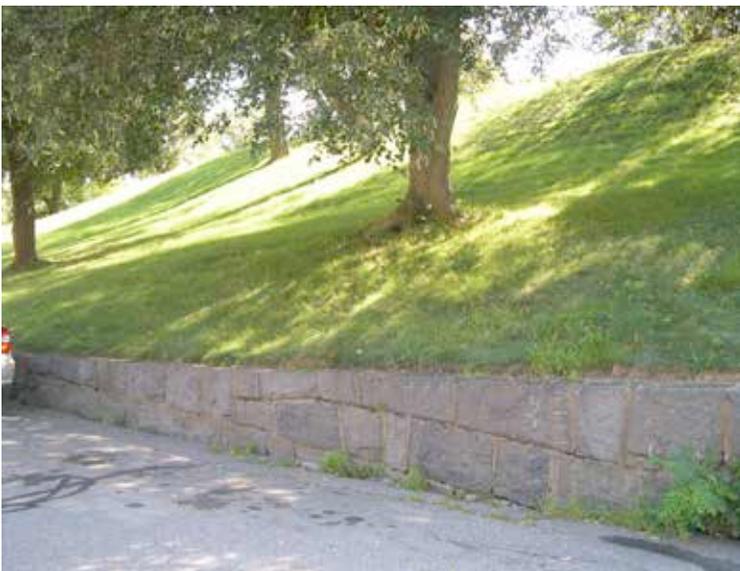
Perimeter wall along School Street, looking southwest. (DSCN5329)
